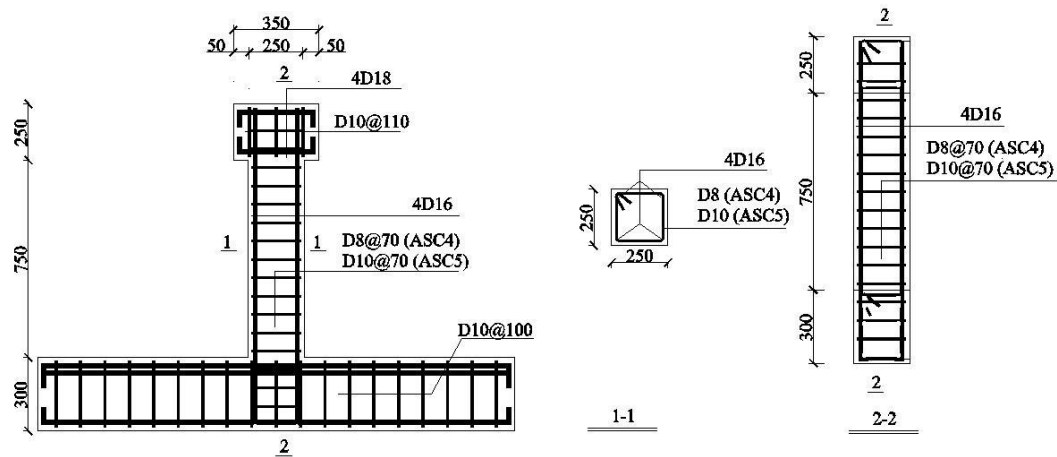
Details of aeolian sand concrete columns (a)ASC1
